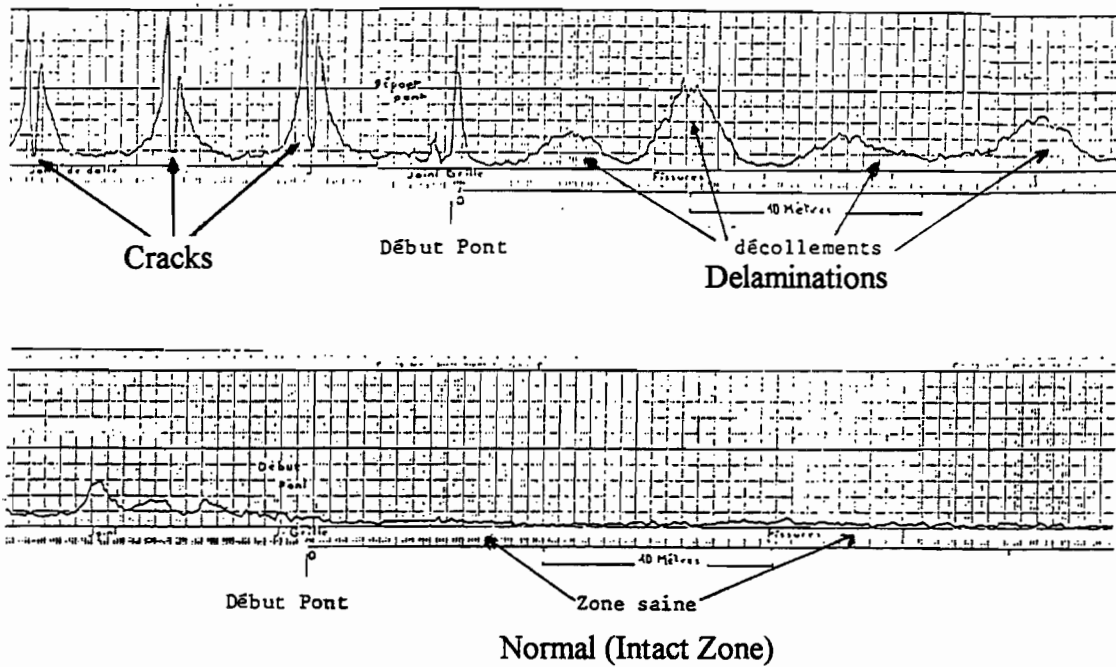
Typical Output from the Collograph Showing Delaminations and Cracks (Le Laboratoire Central des Ponts et Chaussées, 1983)
